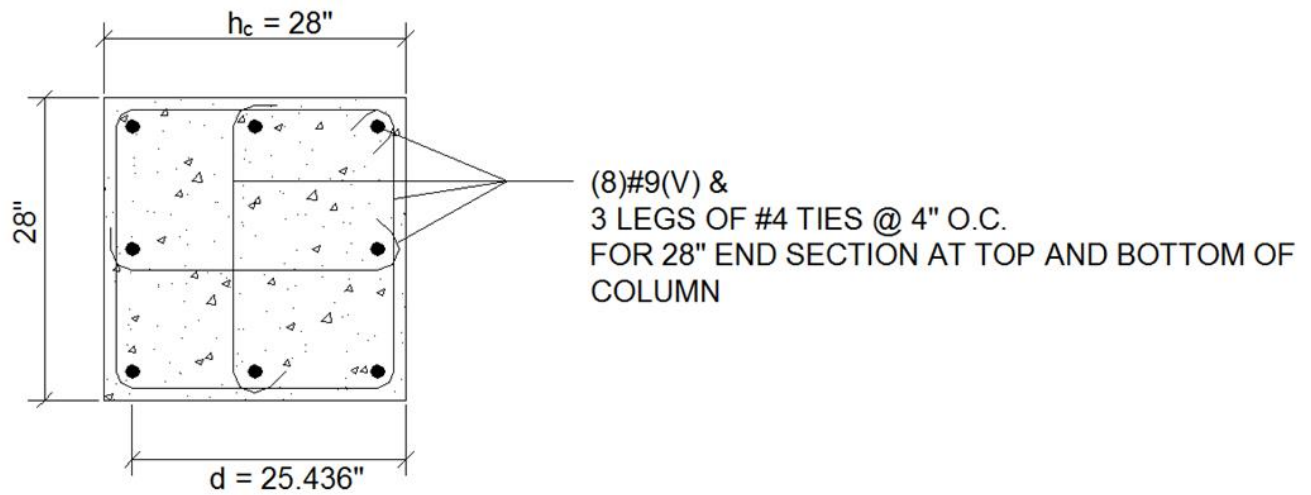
Exterior column, cross-section at end of column at 2nd – 6th floor levels based on SDC D design.
